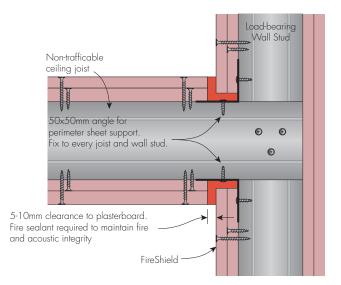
Non-Trafficable Ceiling to Plasterboard Wall
